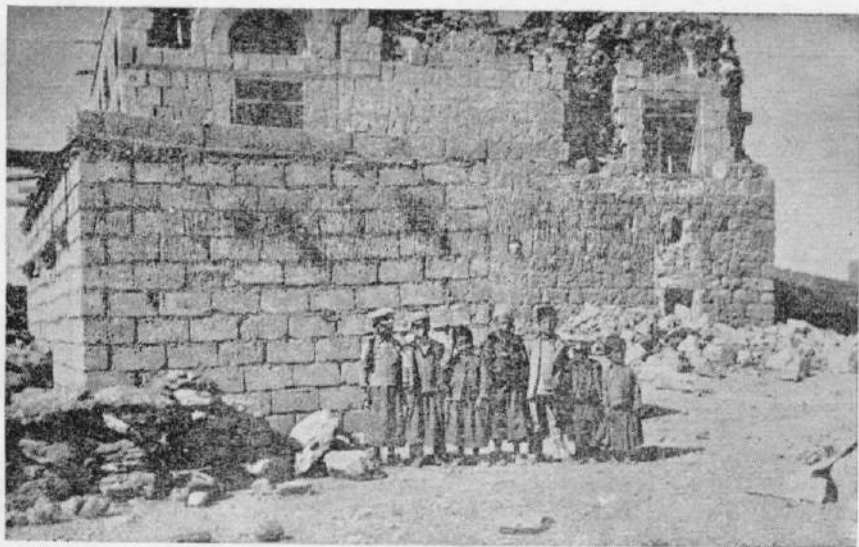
A single storeyed house built from solid concrete blocks in gypsum mortar remains undamaged and a two storeyed stone house badly damaged with collapse of corners in village Hizarat Mangada (See discontinuous use of wood pieces).
